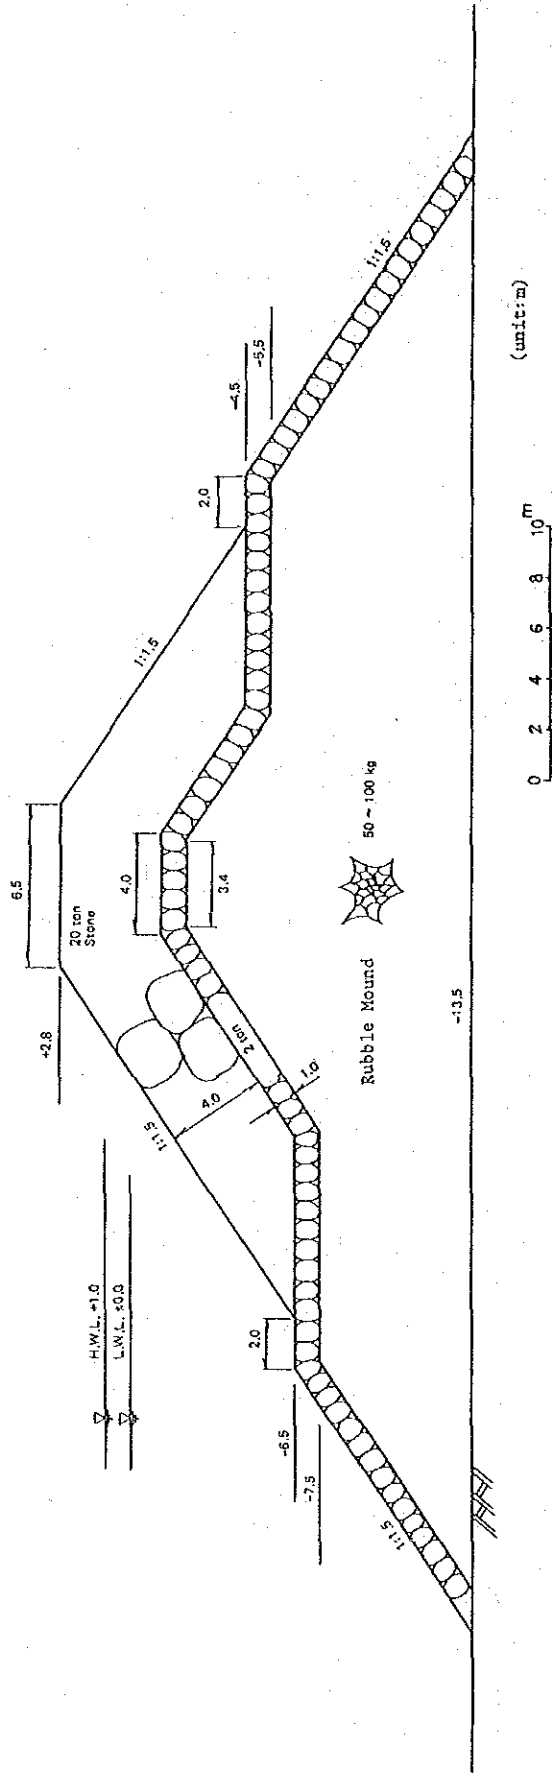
Cross Section of Breakwater (Alternative C)
